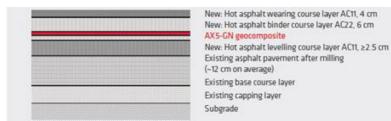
Cross section of the existing pavement overlaid by new asphalt enhanced with geocomposite
